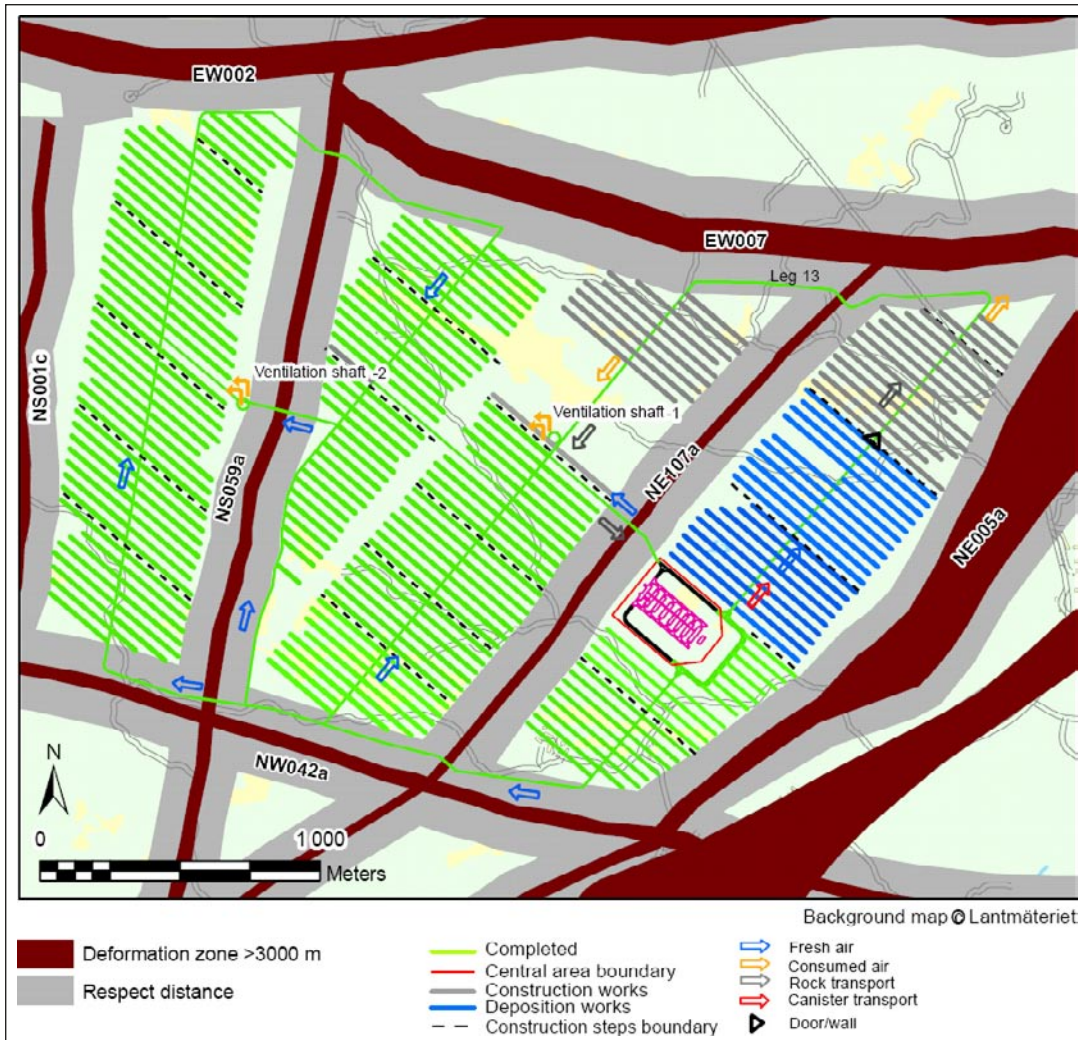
Excavation in construction steps 17 and 18 and deposition works in construction steps 15 and 16.
